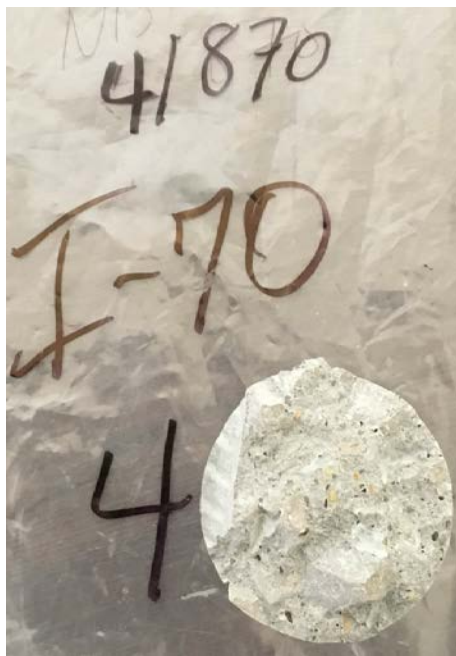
Photos of the concrete cores for Bridges 41870 (First Round).
